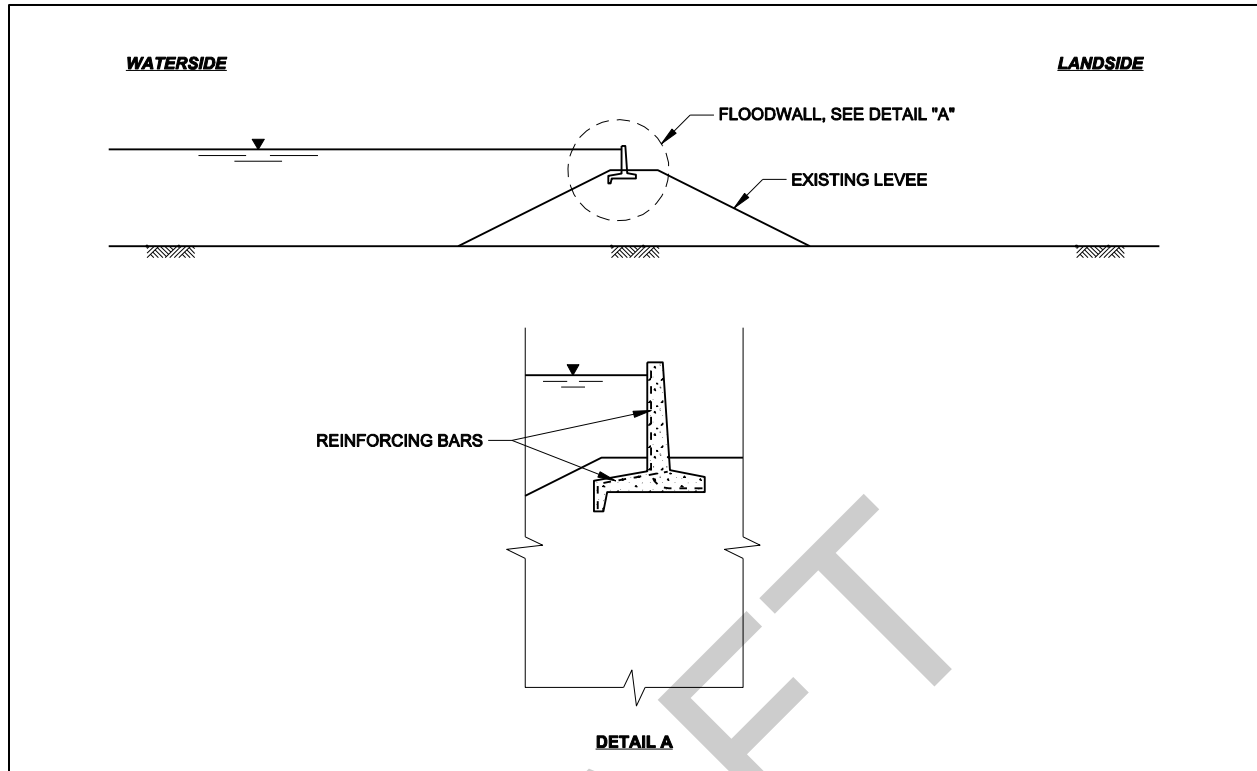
Inverted T-type Floodwall Levee Enlargement.
